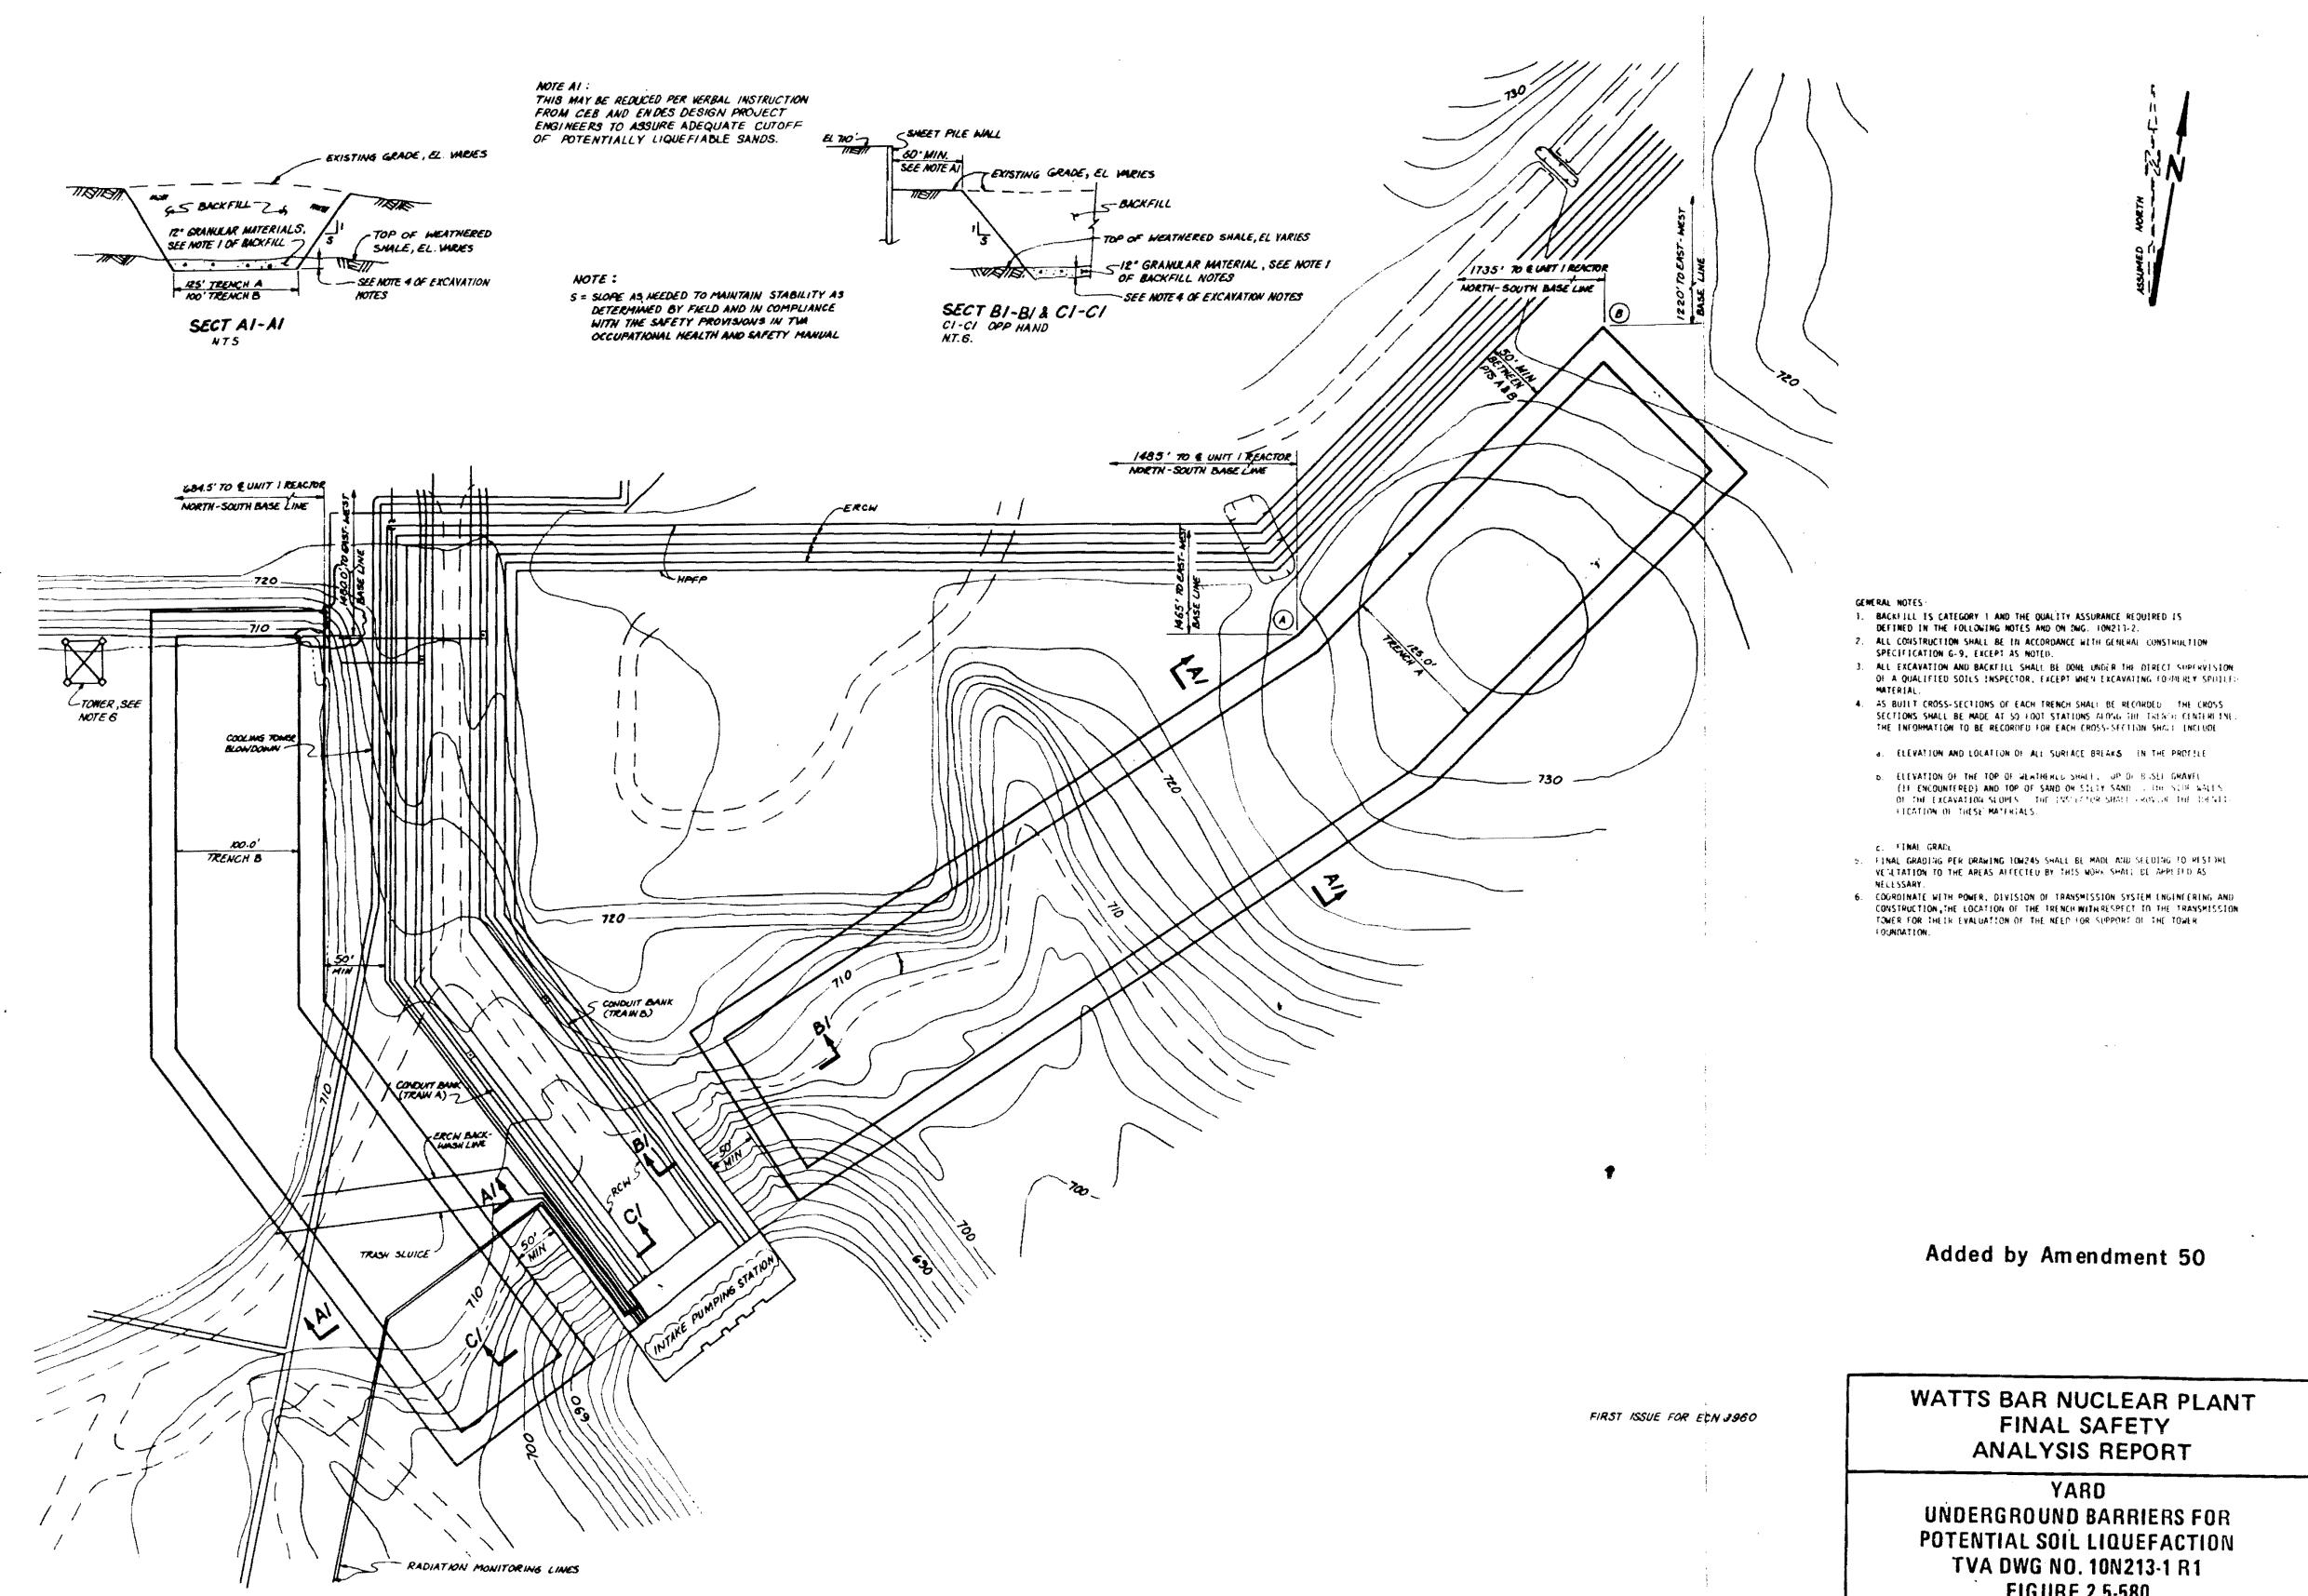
Yard Underground Barriers for Potential Soil Liquefaction
